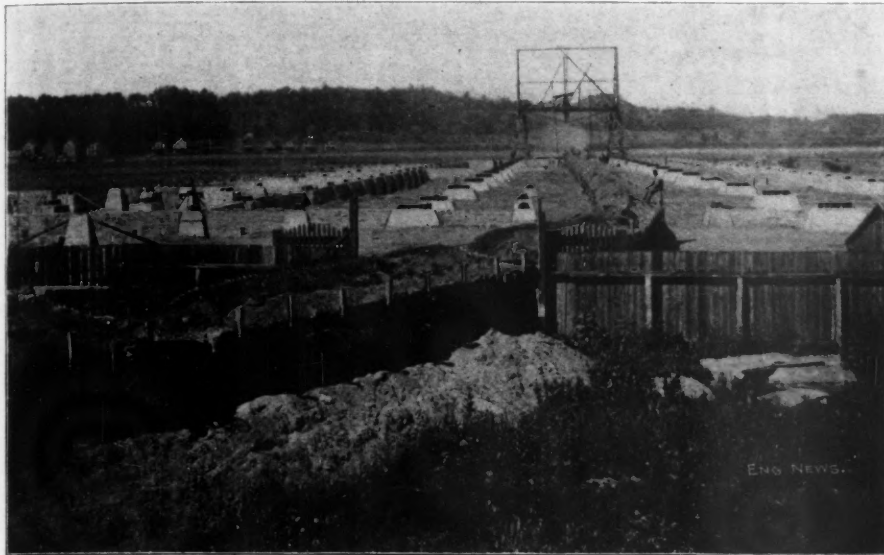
VIEW SHOWING COLUMN FOUNDATIONS AND PARTIALLY FILLED-IN FLOOR.
